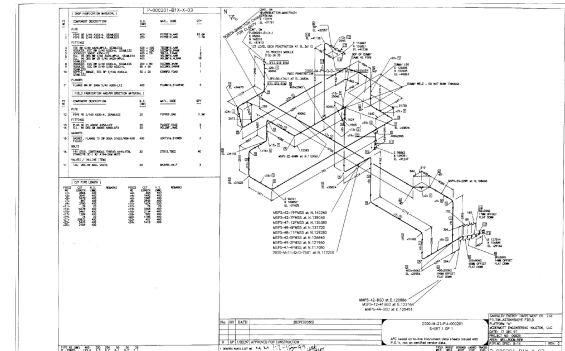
to 4 pipelines and minimum information present on the drawing).
